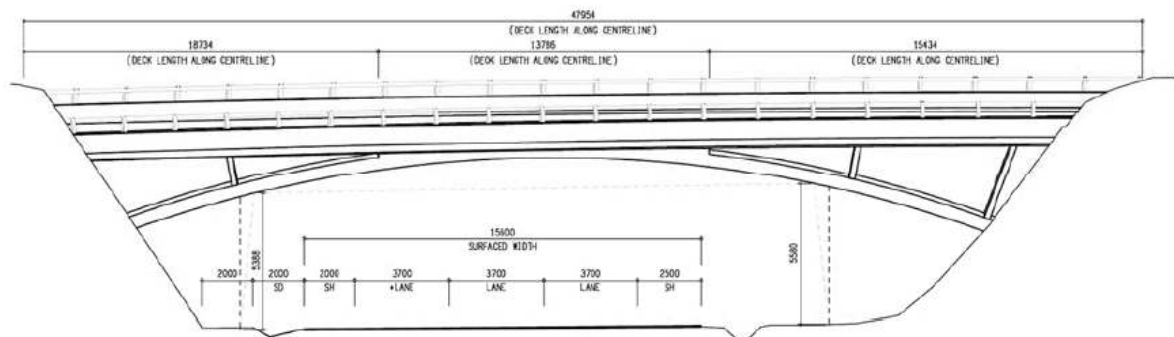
Elevation of the arch bridge (looking south) and lane layout
